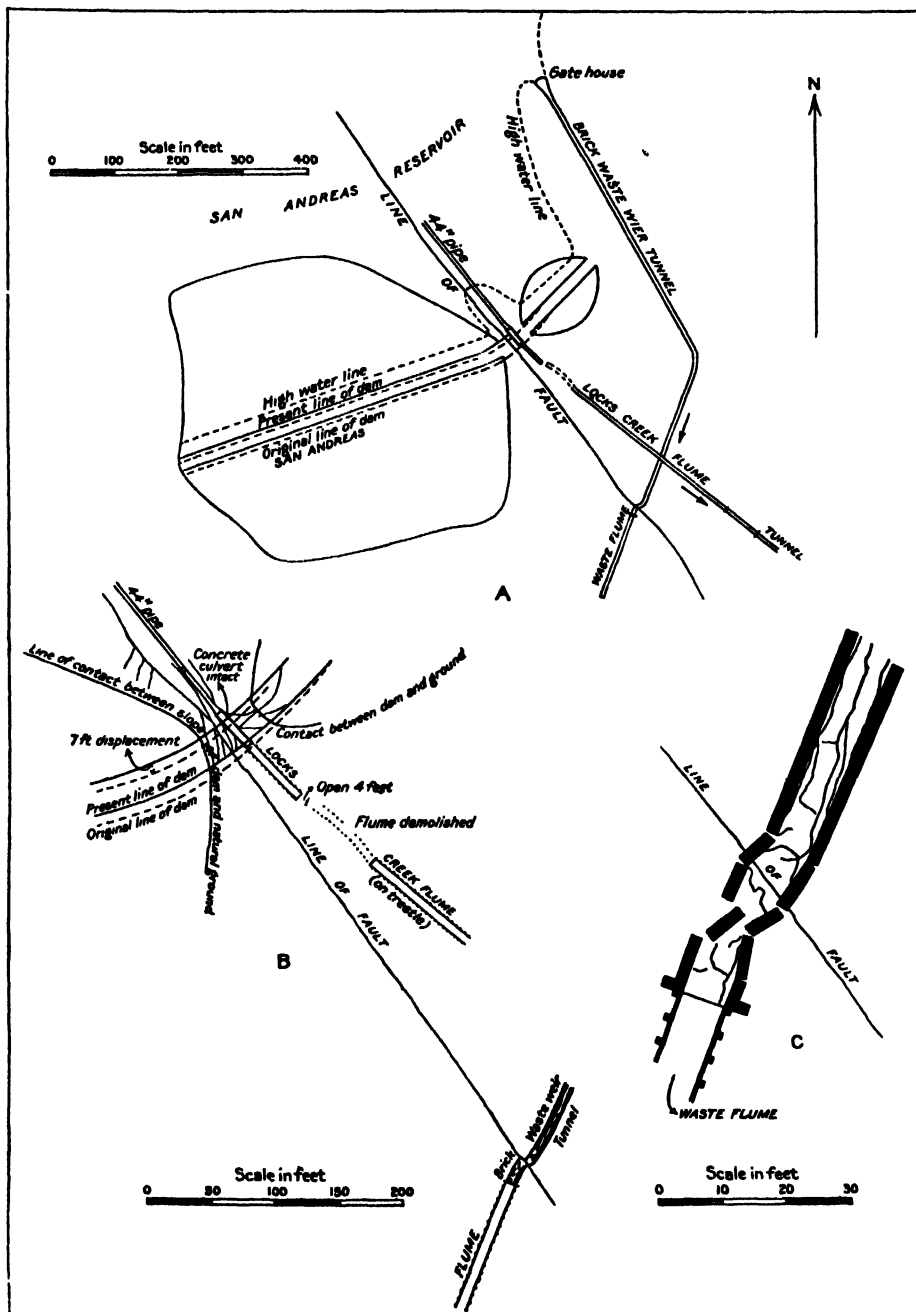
Intersection of San Andreas dam by fault. A. Plan of dam in two parts, with rock between. B. Relation of dam to waste weir tunnel. C. Detail of waste weir tunnel.
